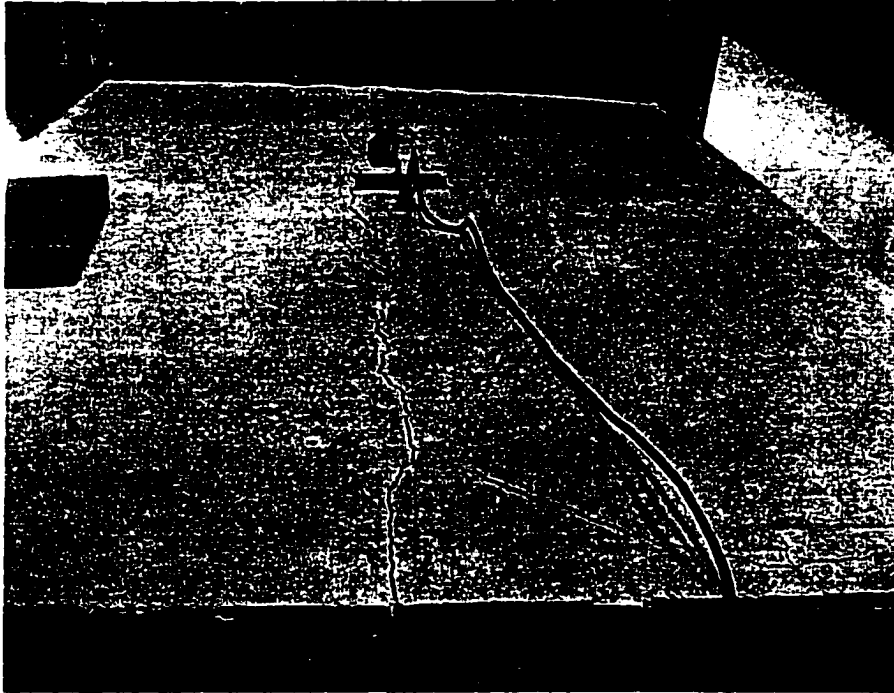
Longitudinal cracks caused by line loading on Beam U_1 .
